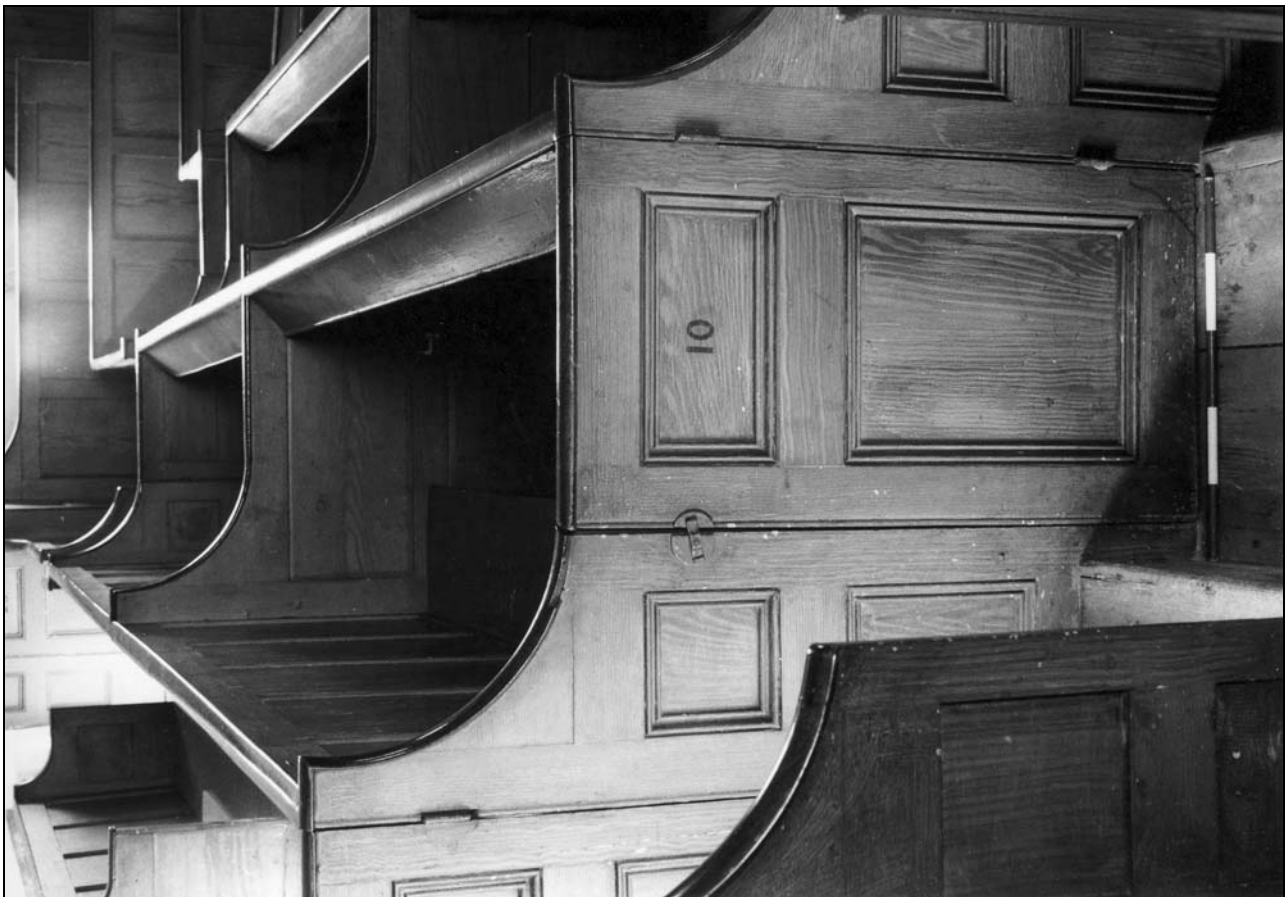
Numbered pew door on south side of gallery, looking west (film 3, frame 1)
